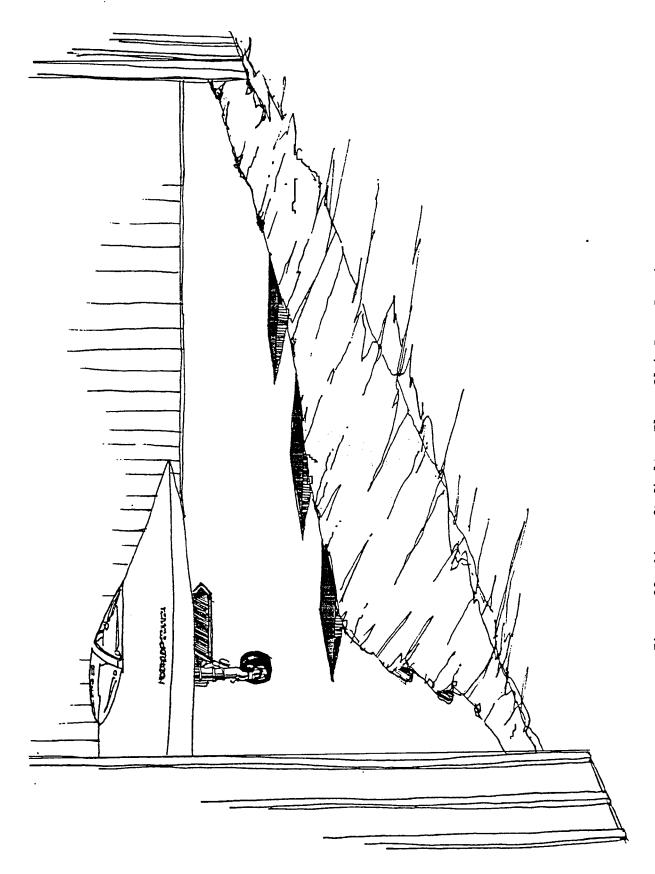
Aircraft Shelter Floor Slab Ramp Repair.
